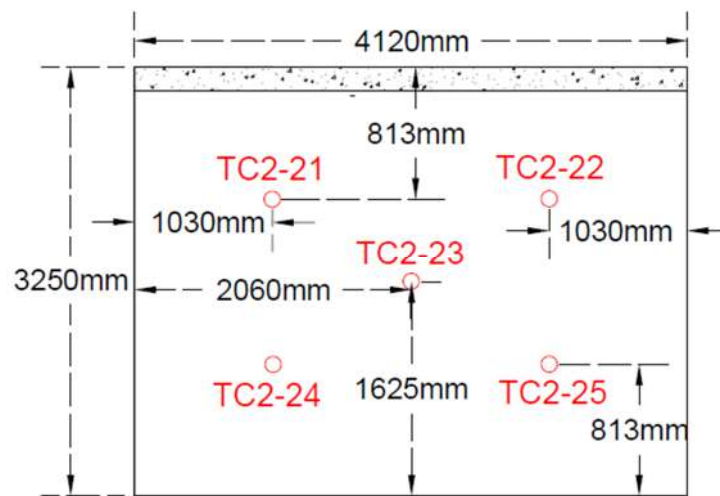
Instrumentation locations on roof slab (plan view)
